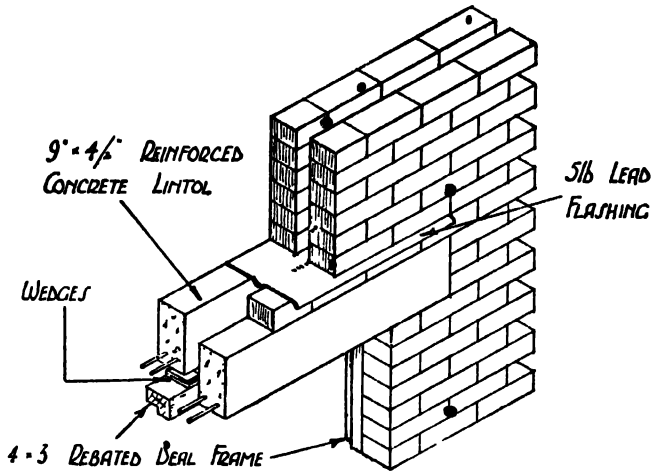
CAVITY WALL - CONCRETE HEAD TO OPENING
